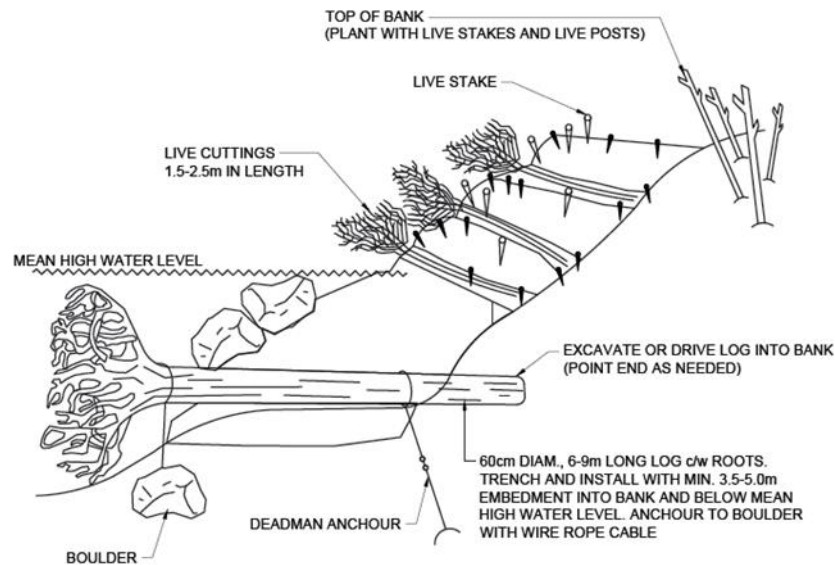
Typical bank cross section showing bank slope, LWD, and live stakes. Note this is a generalized drawing and no cable will be used in the prescribed works.
